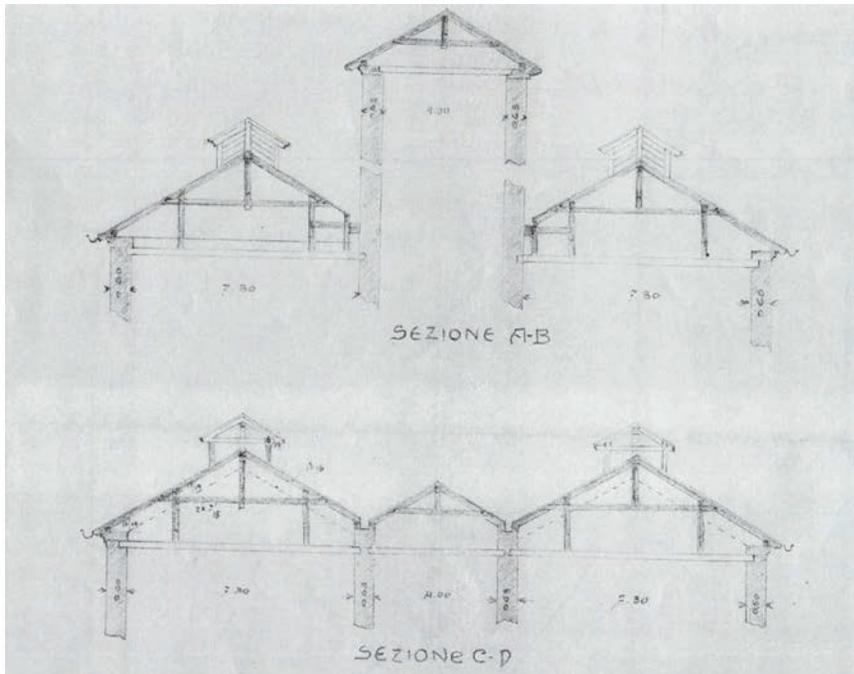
Engine room for hydraulic plant, roof renovation, 1908, transverse section [12]
